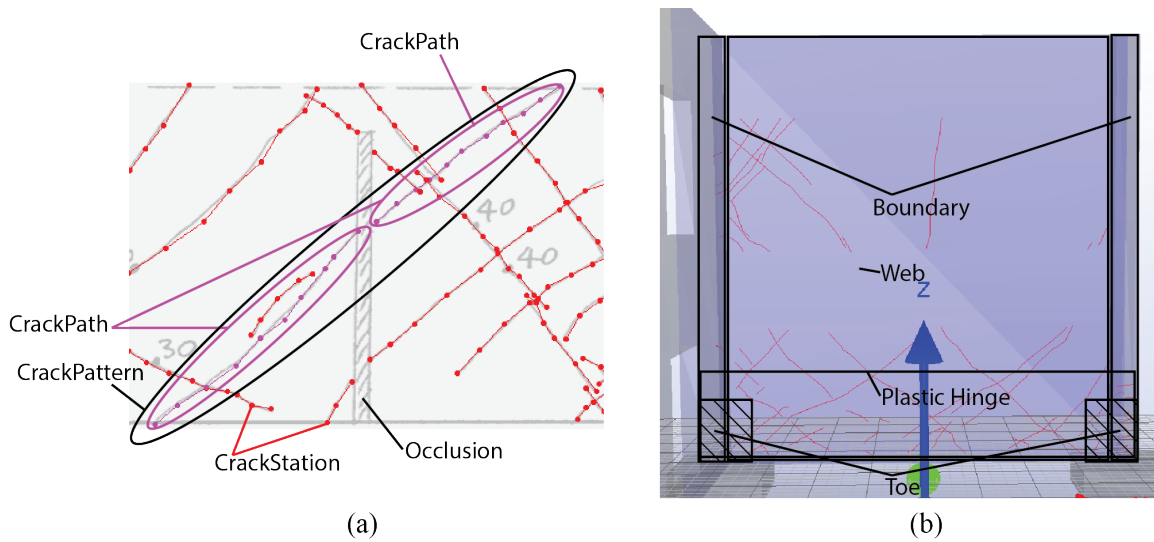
The CrackPattern and CrackPath entities enable representing complex cracking on the components (a). Continuity of cracks across occlusions or cracks, which should be evaluated together (e.g., X-shaped cracks) were represented using the CrackPattern entity. For the visual assessment, the regions, which contain the damages were represented using the DamageElementRegion entity (b).
